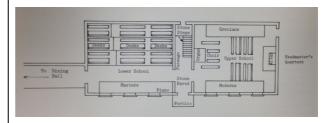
Floor Plan of school classroom 1836, Lloyd Waddy, *The King's School 1831-1981, p73.
